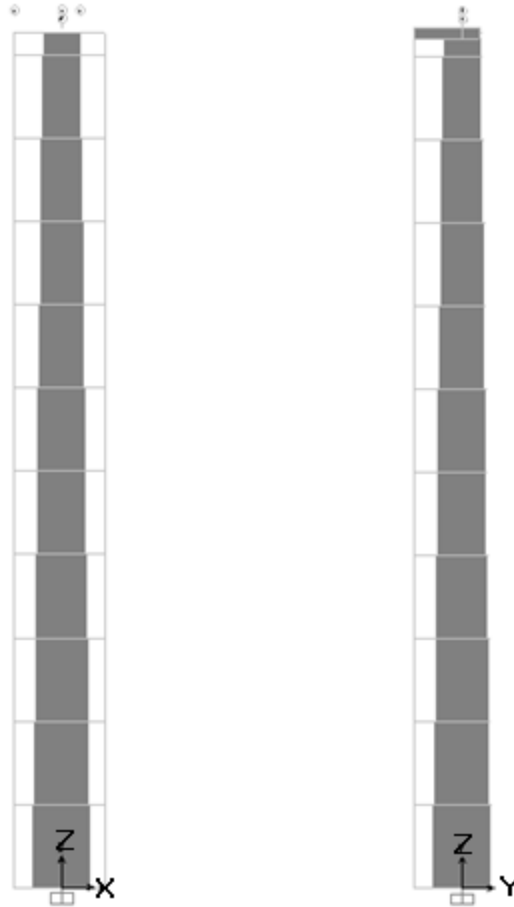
Tower Front and Side View for single-rotor model in SAP2000
